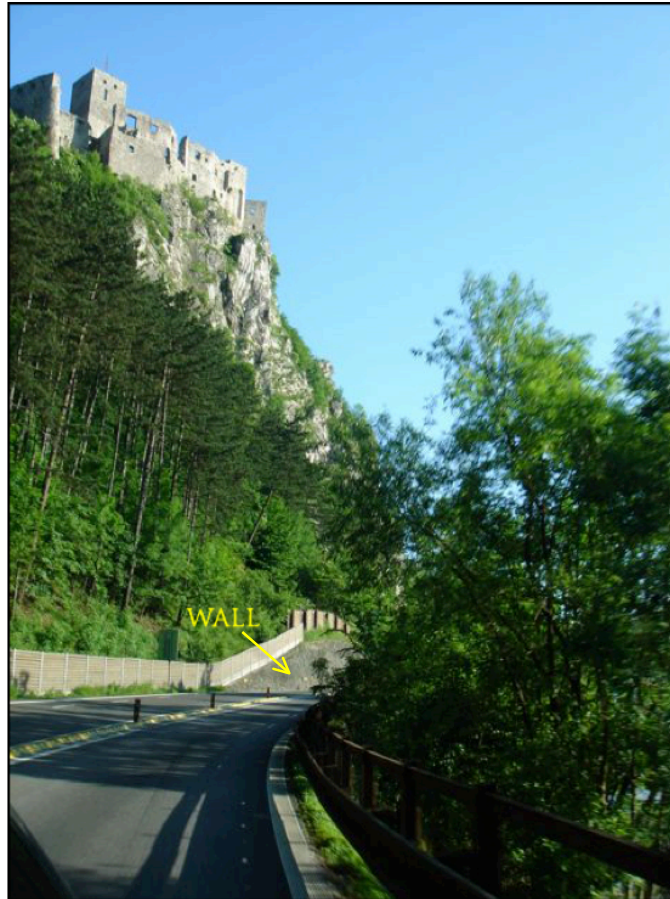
One of the segments on the Žilina – Vrútky collision stretch with a wall running along side it.
